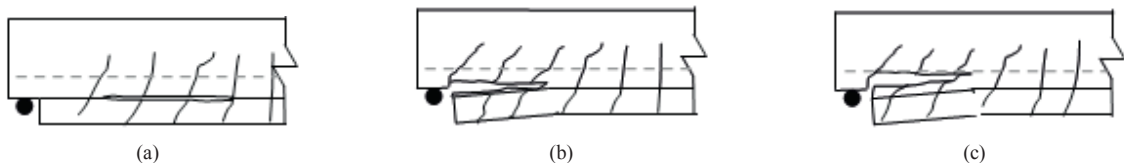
Three types of debonding, (a) Intermediate crack debonding, (b) End peeling, (c) Concrete cover separation
